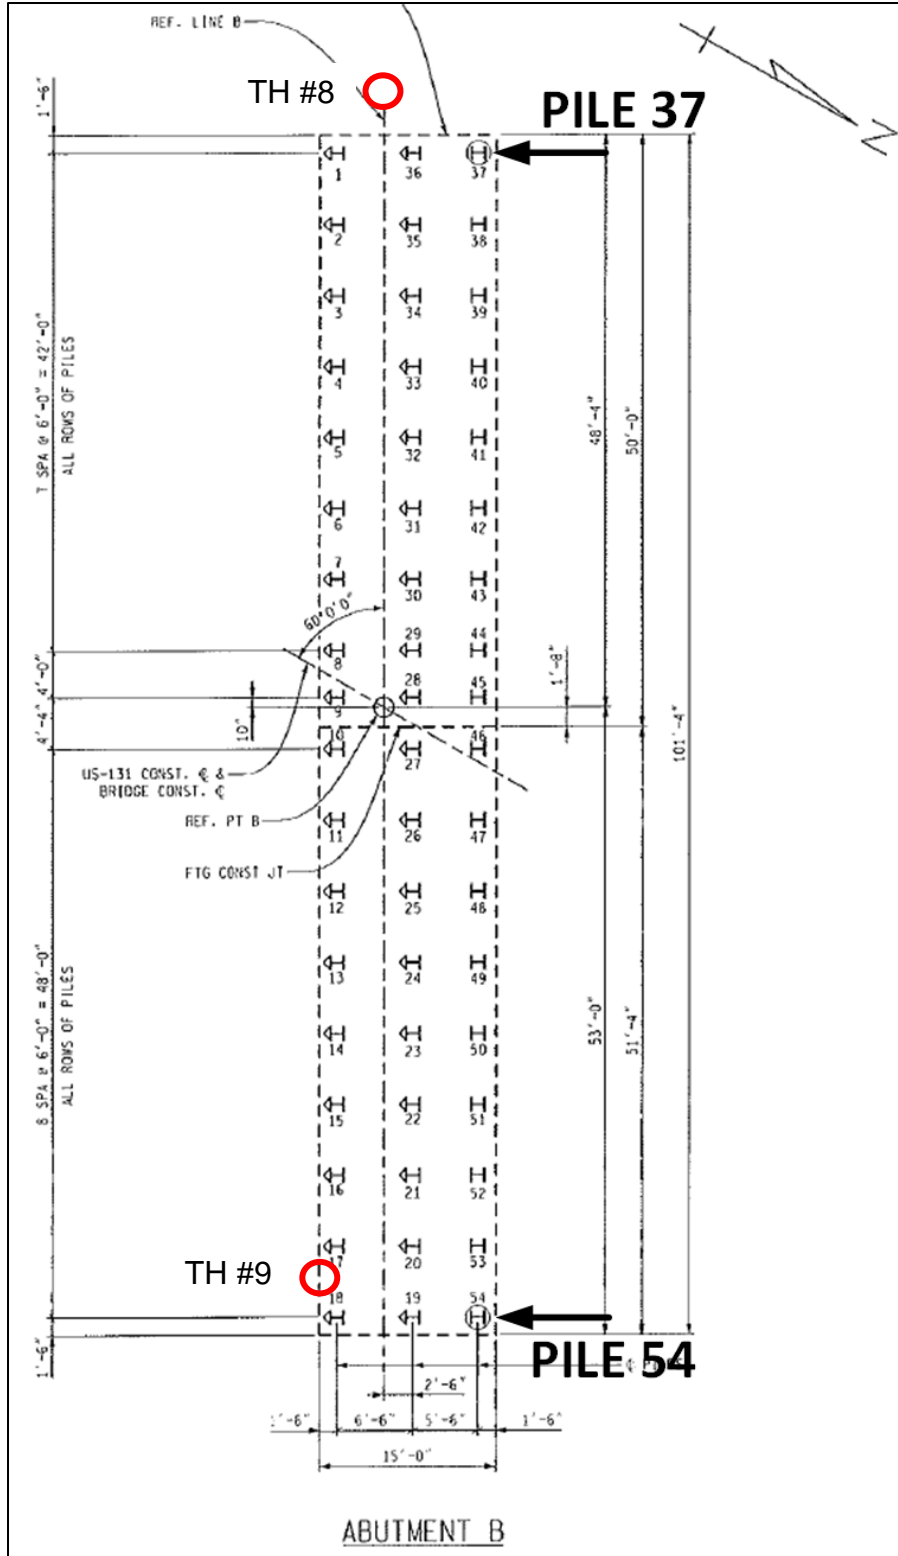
Locations of test piles 54 and 37 at US-131 B site
